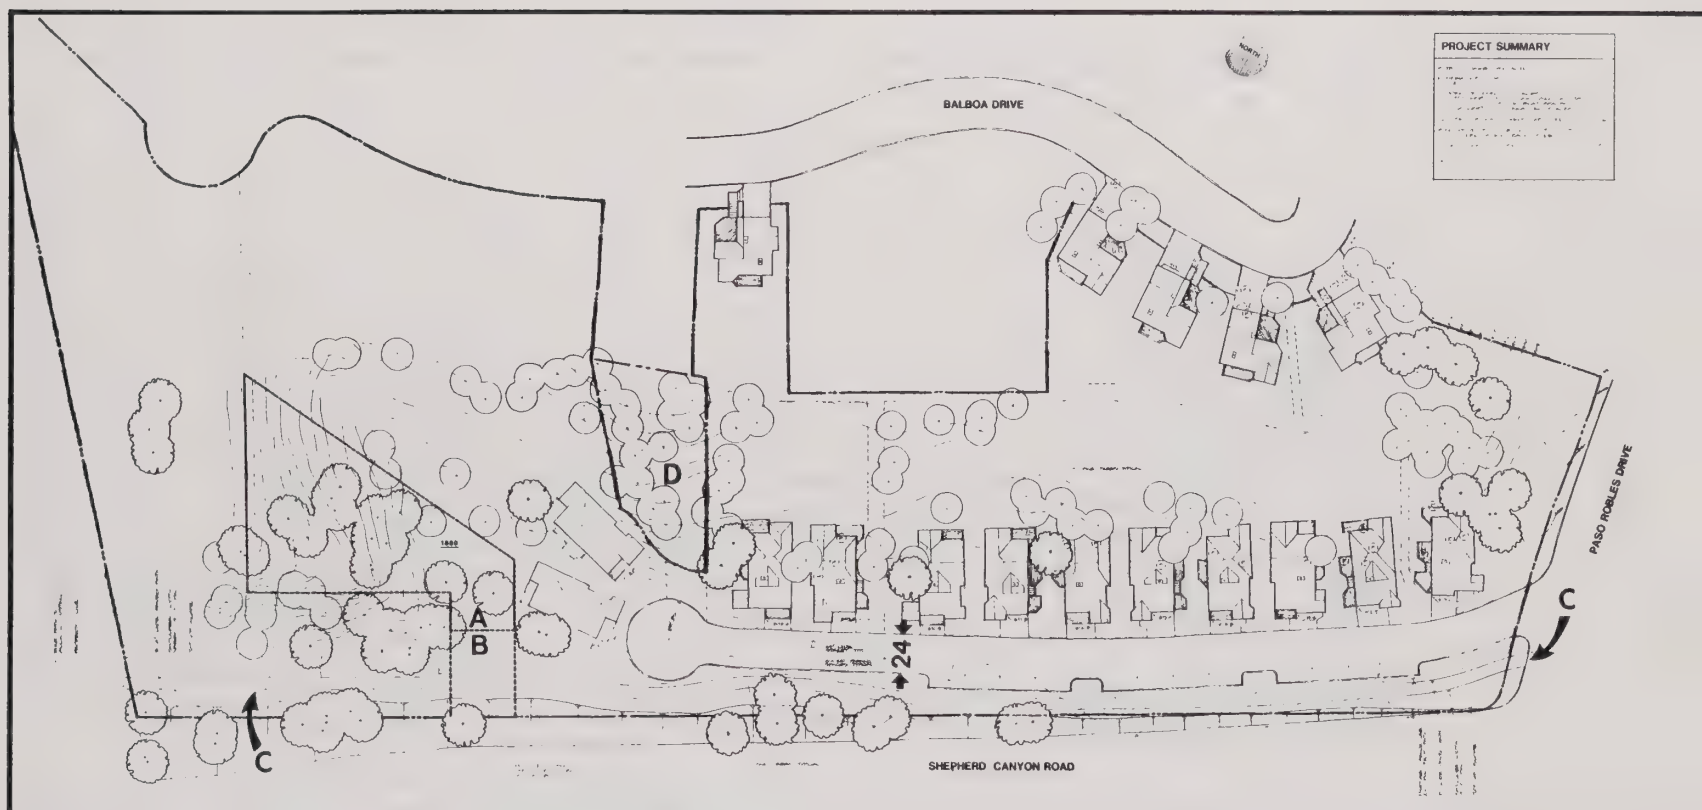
1986 REVISION OF ORIGINAL 1984 PROJECT SITE PLAN
